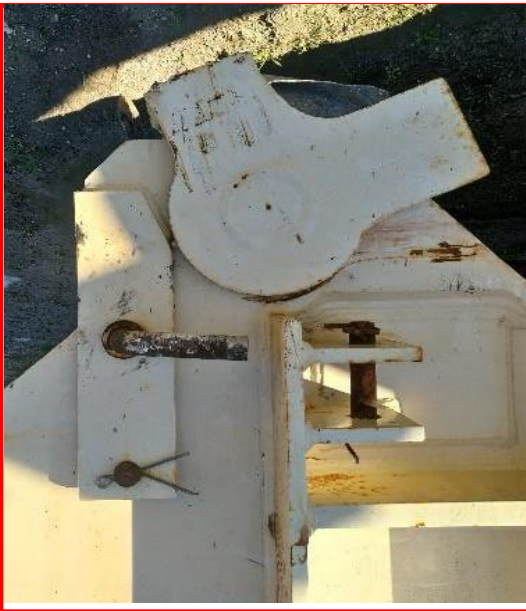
Jib foot bearing connections – turntable side (the first failure)
